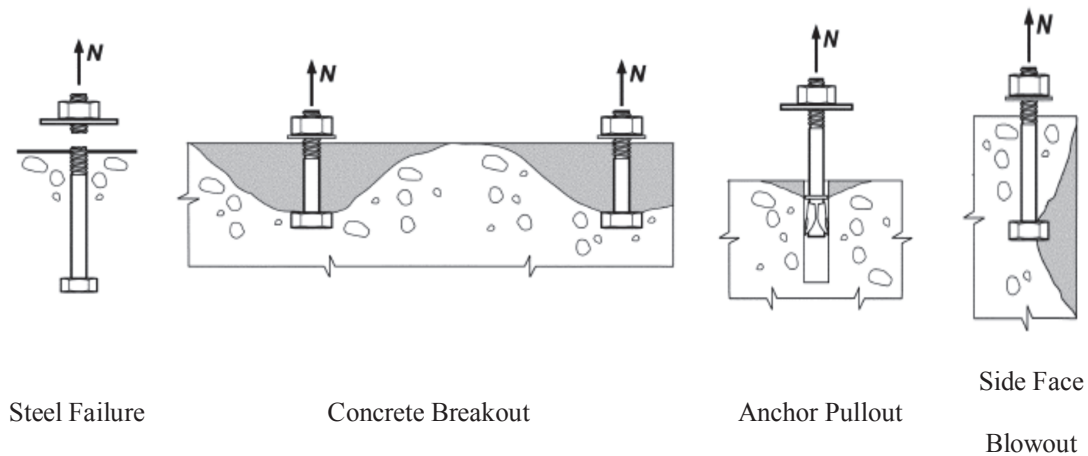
Generic Design Checks for Anchor Bolts in Tension (after ACI 318-11)
